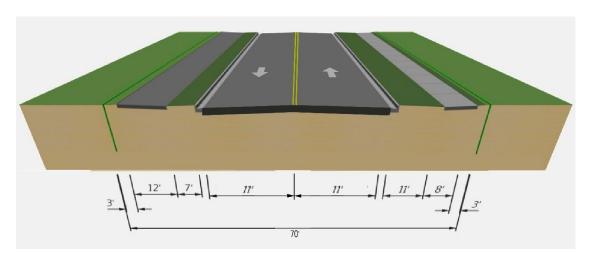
Proposed New Quadrant Roadway from Old US 41 to Race Track Rd
